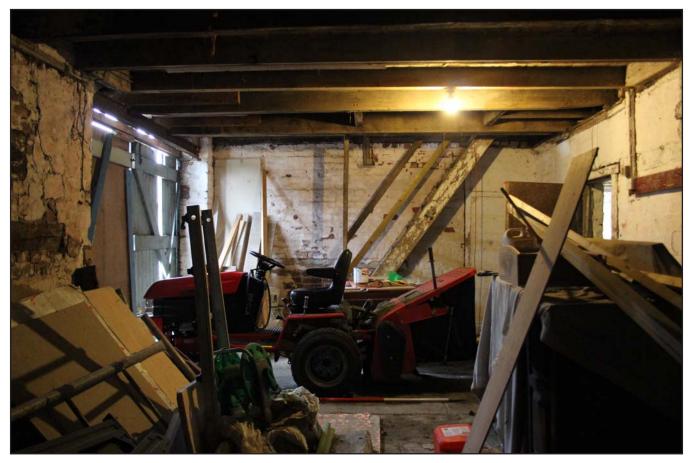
3. Barn - northwestern elevation- from southeast - Scale 1m
